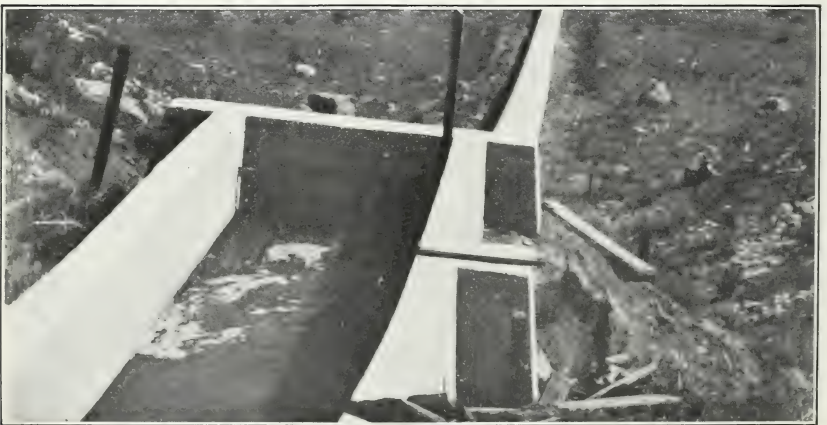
ENTRANCE WELL SUBMERGED, REDUCING AMOUNT OF AIR CARRIED INTO PIPE.
